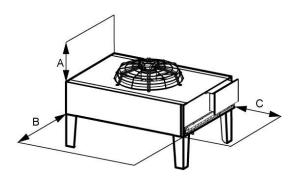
Schematic diagram of installation and maintenance space on the front of a single fan outdoor unit
